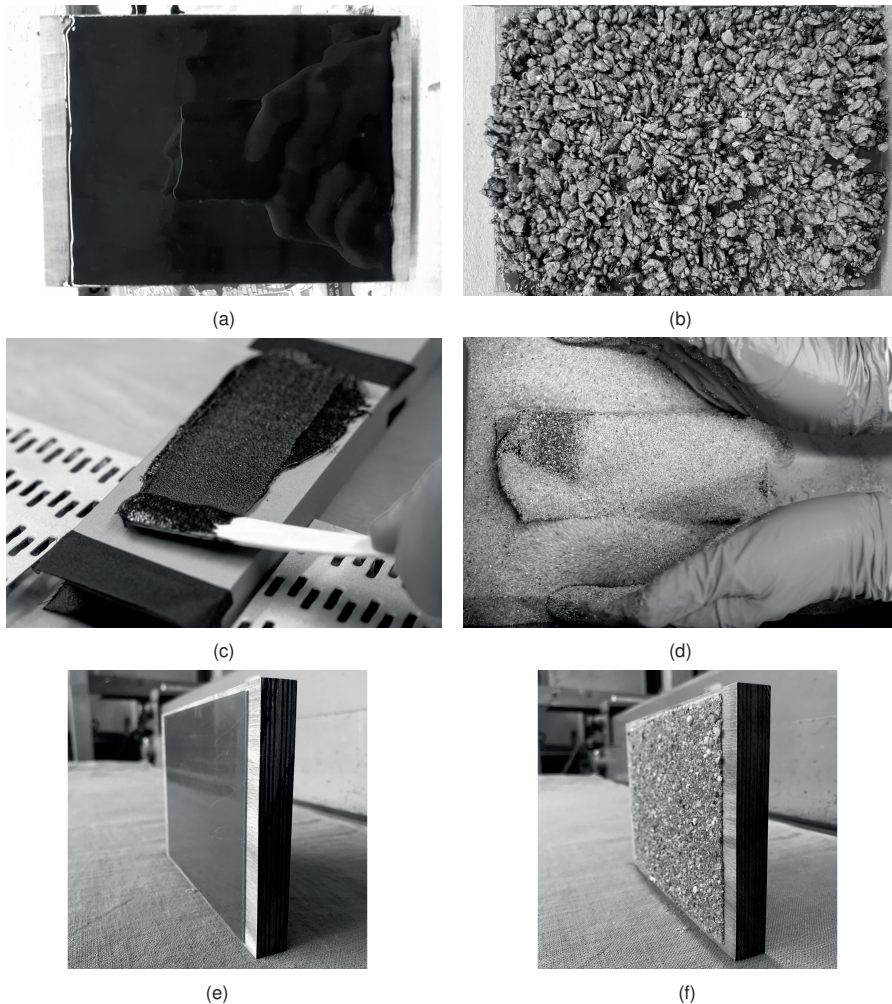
Differently coated specimens: (a) Jowat 2K-SE 690; (b) coated with grit; (c) Sika Sikadur-370; (d) coating with sand 0.5–1.0 mm; (e) Lohmann DuploTEC 10650; (f) coated with sand 0–2 mm.
